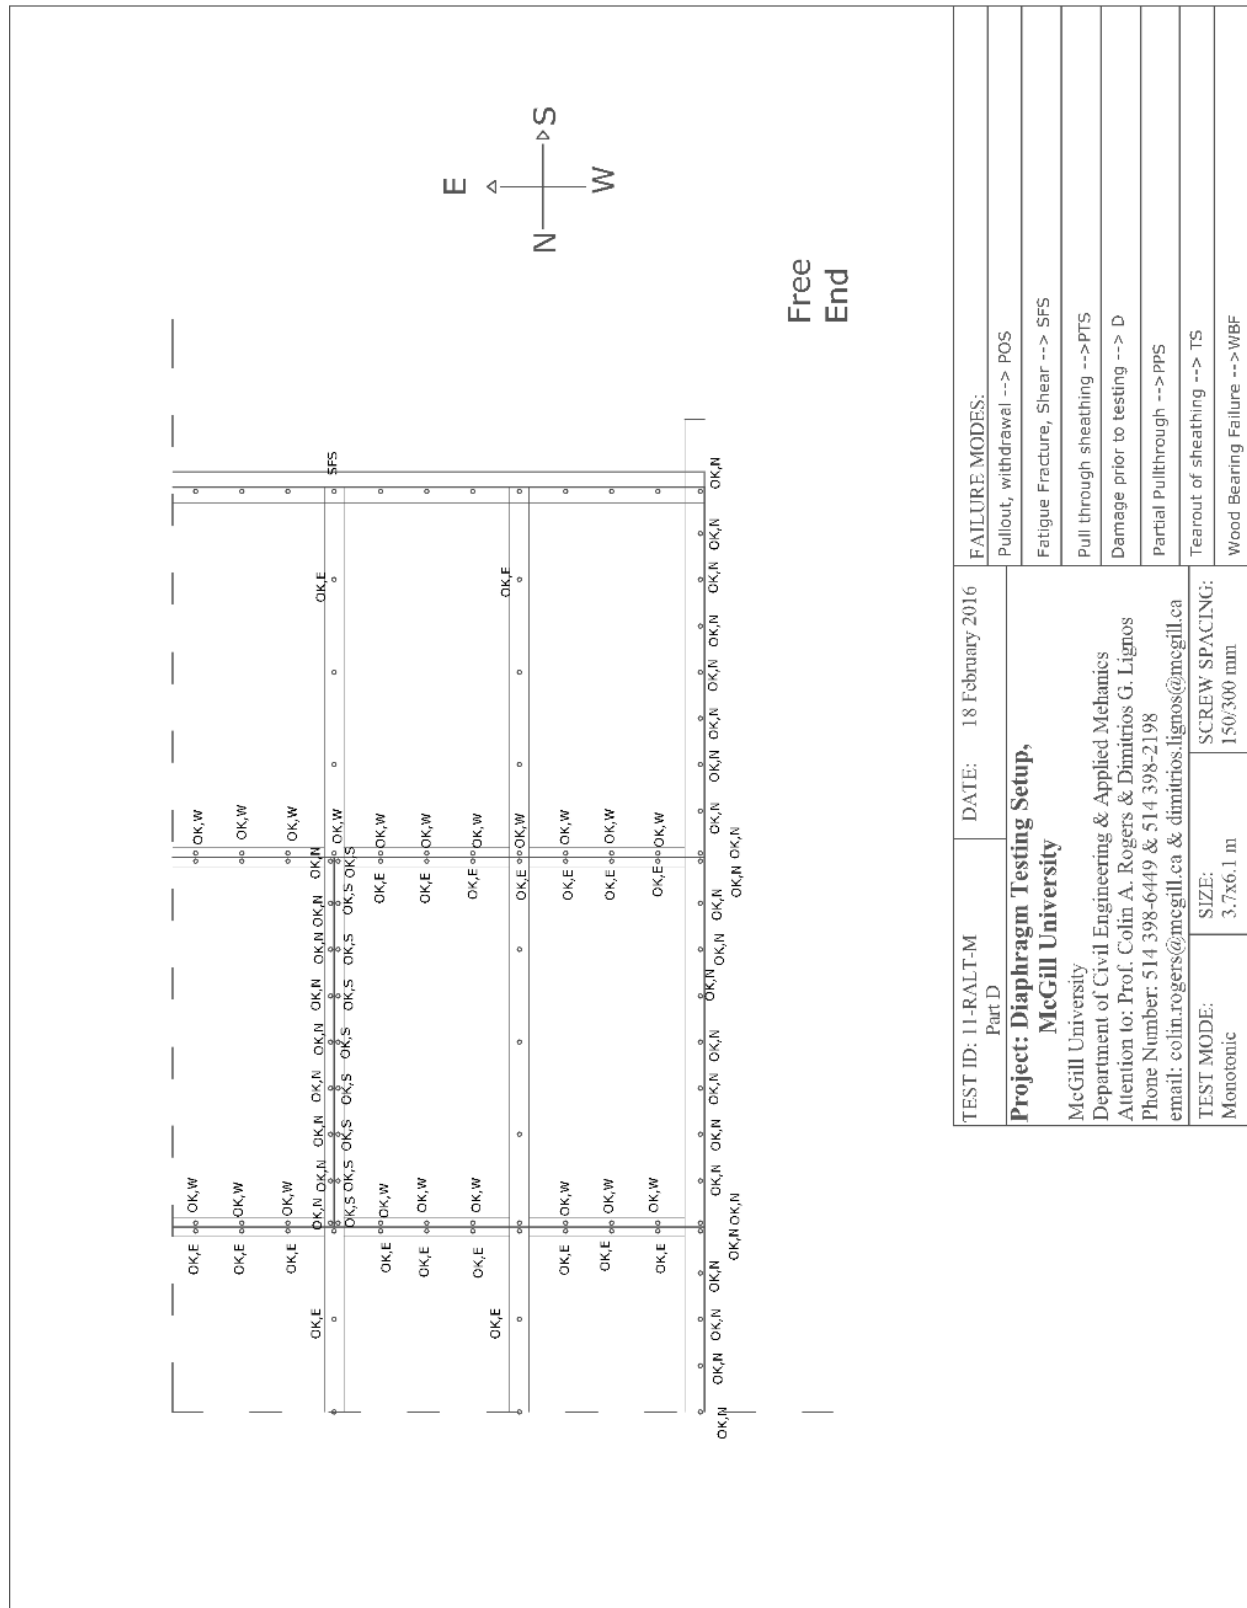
Sheathing Fastener Failure Modes Part D Specimen 11-RALT-M
